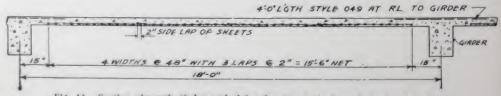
Section through girder and slabs showing typical mesh design for slabs.
